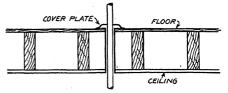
ALLOWING FOR EXPANSION OF PIPE THROUGH FLOOR AND CEILING
